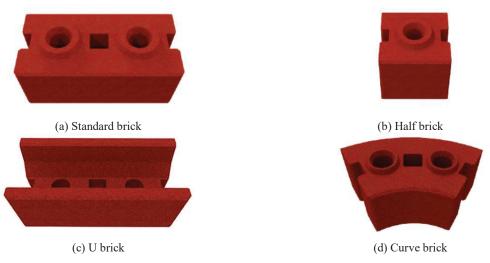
Typical size and shape of Interlocking Hollow Brick System
